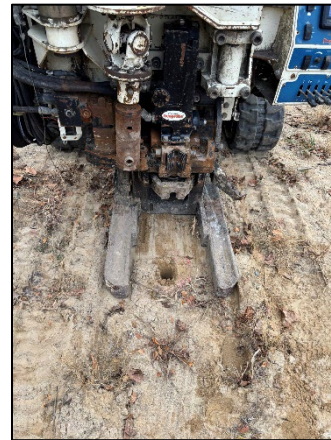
Viewing 8225 SB02 Drilling, Facing North.
